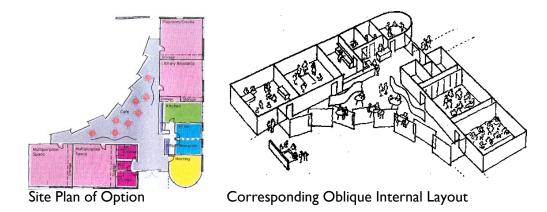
Architectural Sketches of Design Options (Penoyre and Prasad, 1998).
